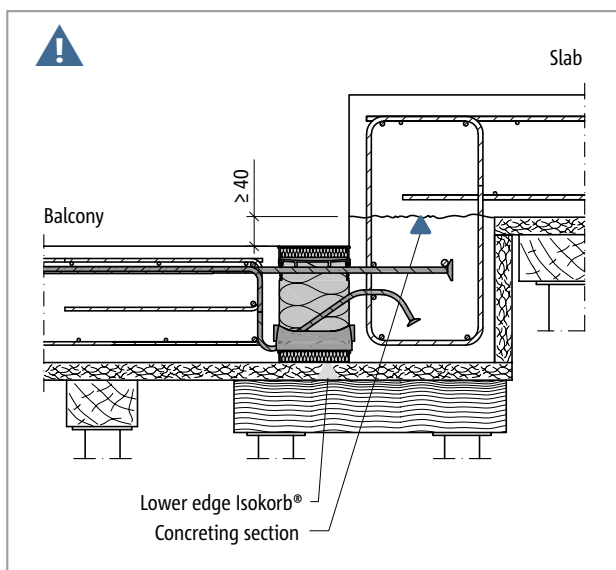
Schöck Isokorb® XT type K-U: In-situ concrete balcony with height offset downwards
